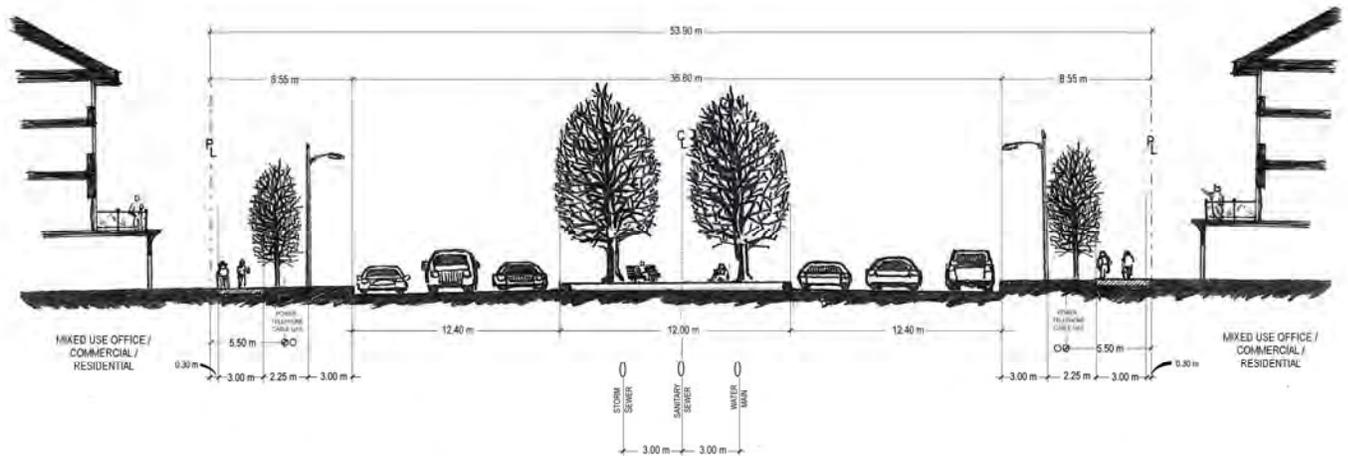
Cross section of Grand Boulevard; showing wide “park block” median
